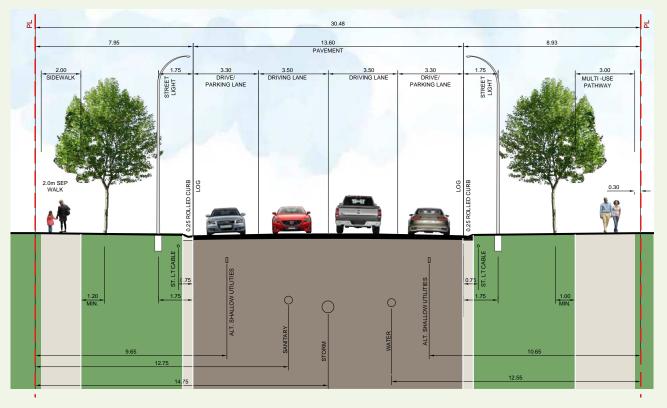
Cross-Section F-F - Collector Street (11.2 m/30.48 m ROW)
